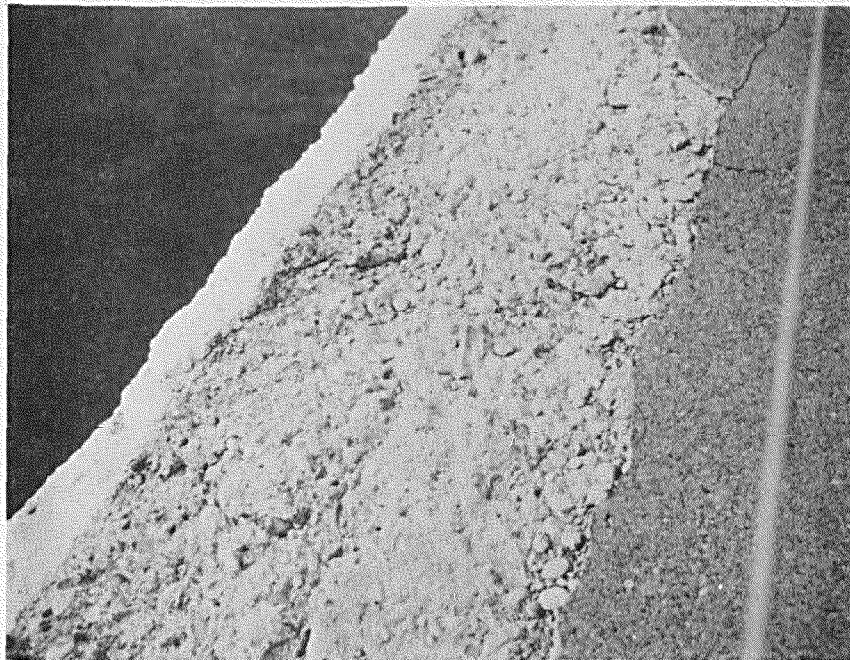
Top Surface of River Wall on Chamber Side Showing Spalling.
